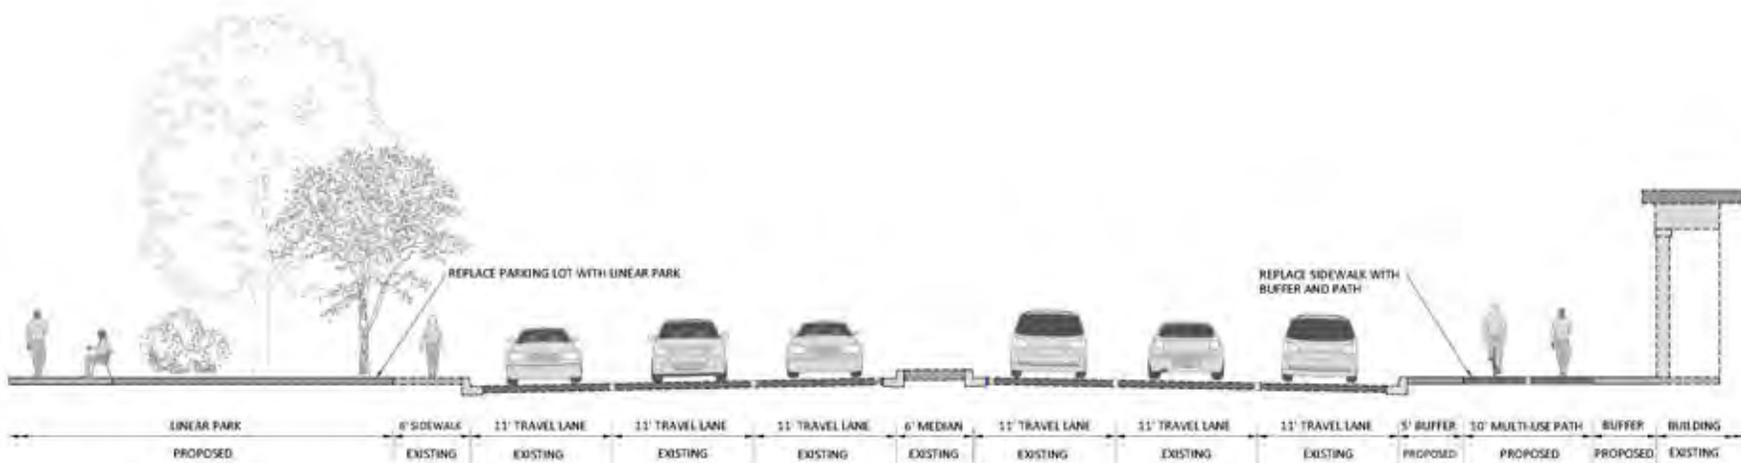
Cross Section West of Fenwick Street NE, Looking East.
